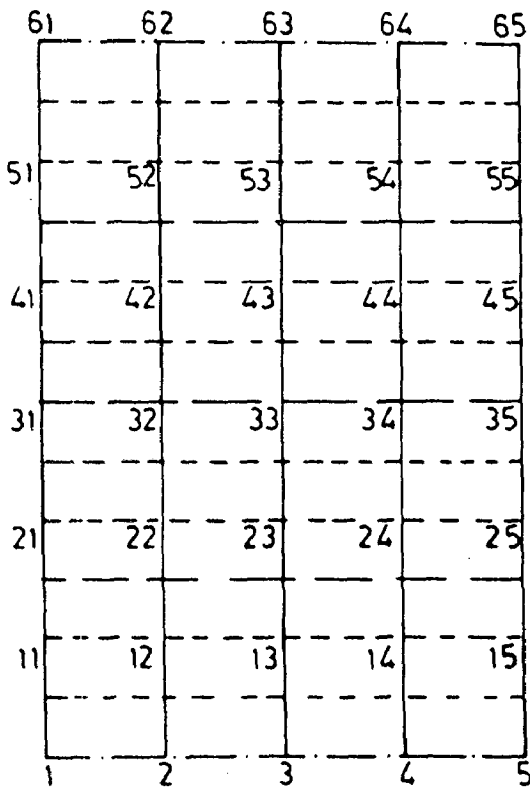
DECK STRUCTURAL ELEMENTS OF CASE - B-
